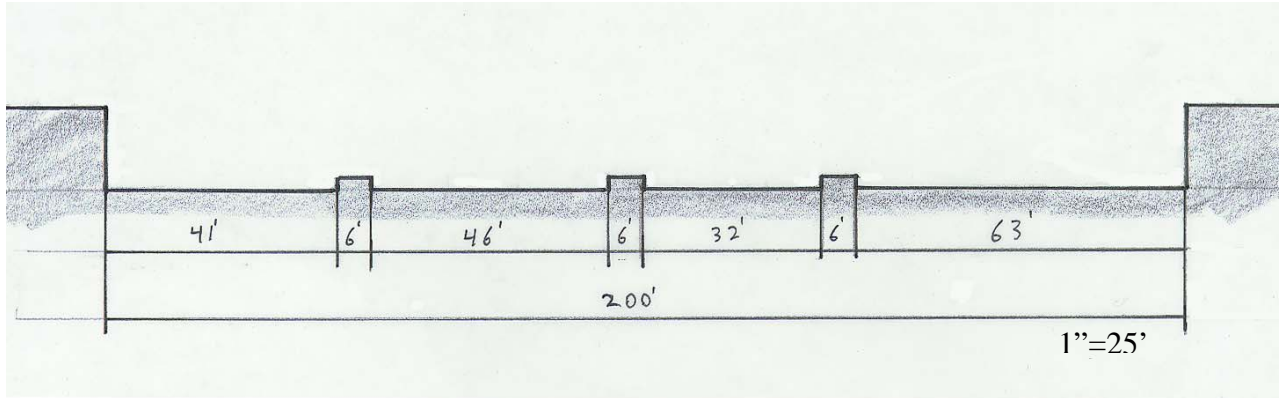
Cross section of Kennedy Boulevard (existing).
